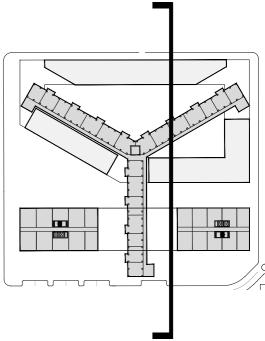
Building Setbacks - Horace Petty North West C Quadrant
